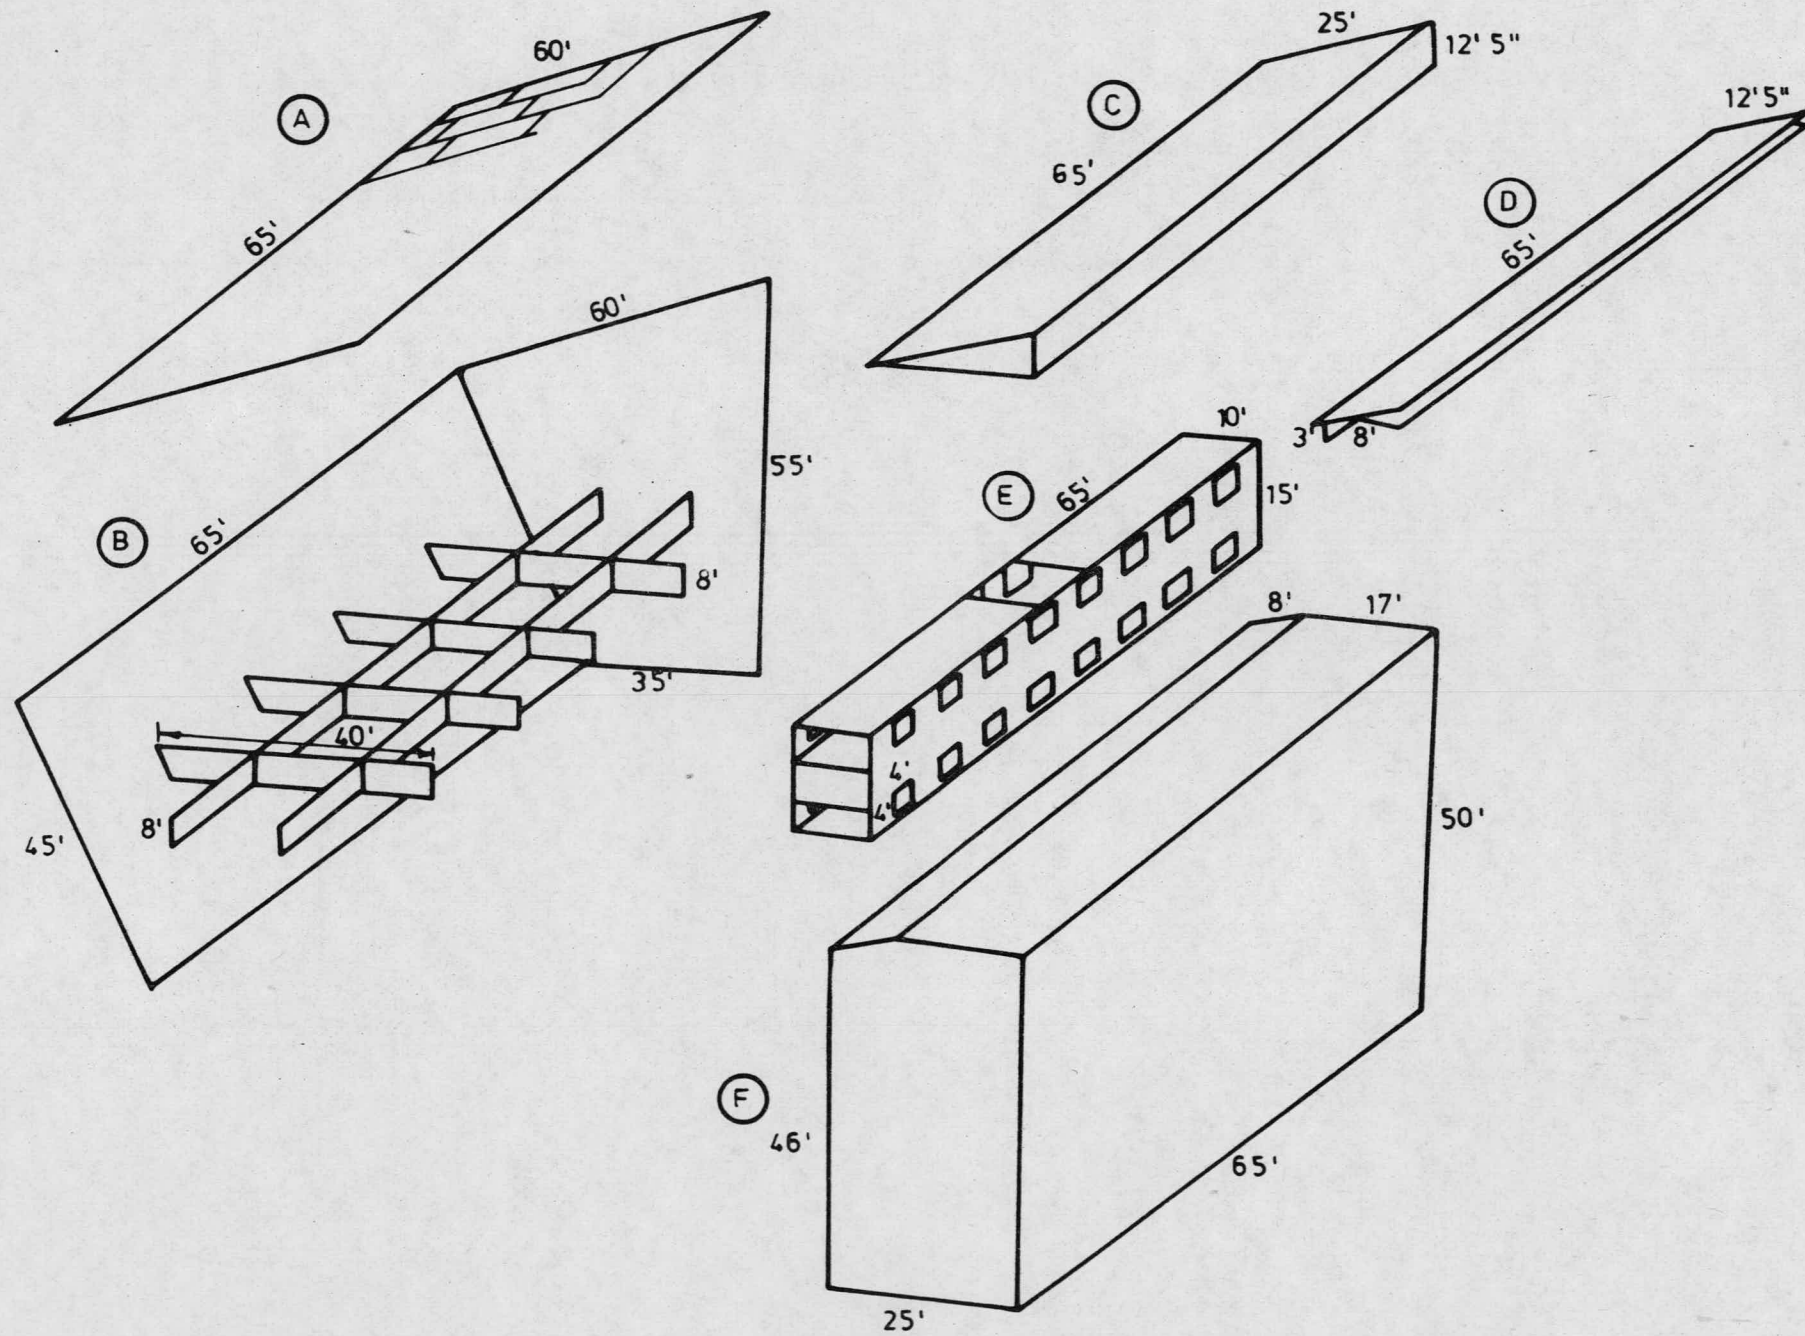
EXPLODED VIEW OF CHAMBER SUPERSTRUCTURE
